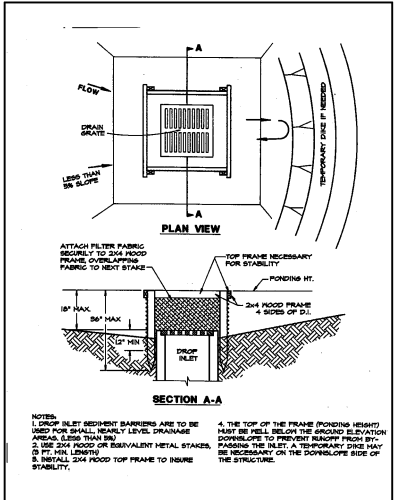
Silt Fence Drop Inlet Sediment Barrier
